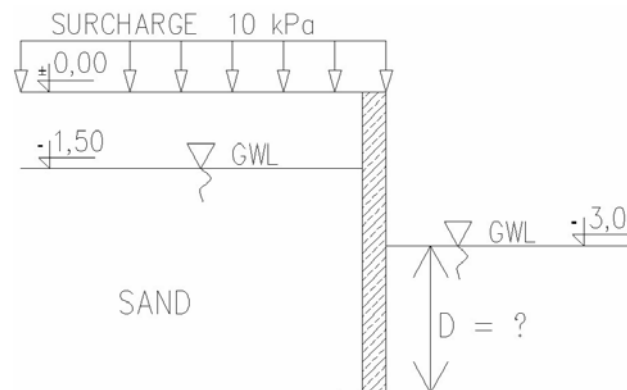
Embedded, cantilever sheet pile retaining wall, 1<sup>st</sup> example case.
